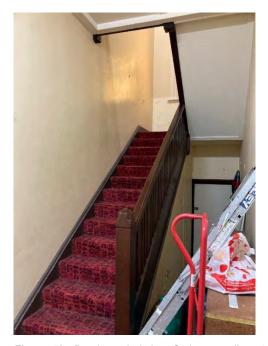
Dog-legged timber Staircase adjacent to the entrance hallway.
